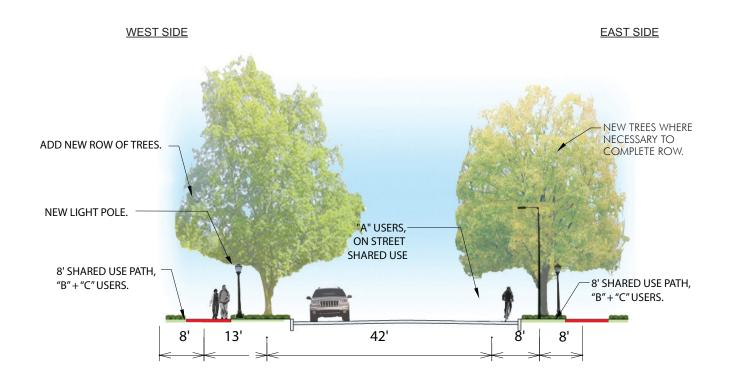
The Hub: Zone 11 3rd Street - Central Avenue to Wayside Park
